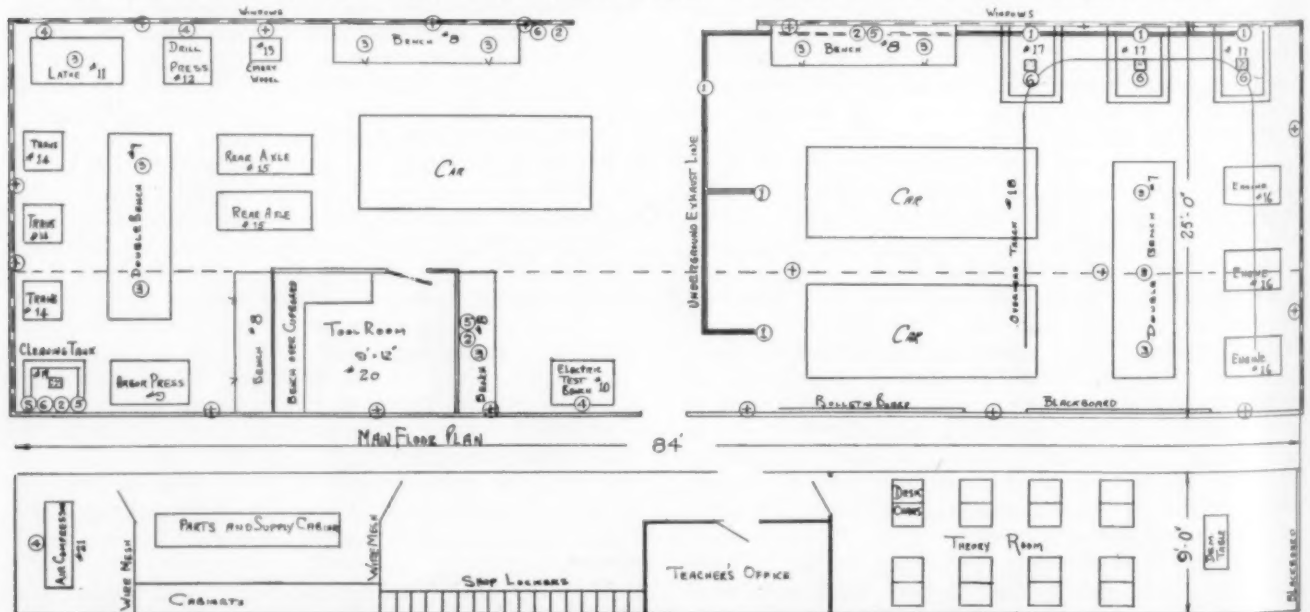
Transportation (including Auto Mechanics). Legend: 1. exhaust outlets, 2. compressed air outlets, 3. vises, 4. special electrical outlets, 5. greasing equipment, 6. trouble lights, 7. engine repair bench, 10. engine analyzer, 13. grinder, 14. transmissions, 17. benches, 19. welding outfit
